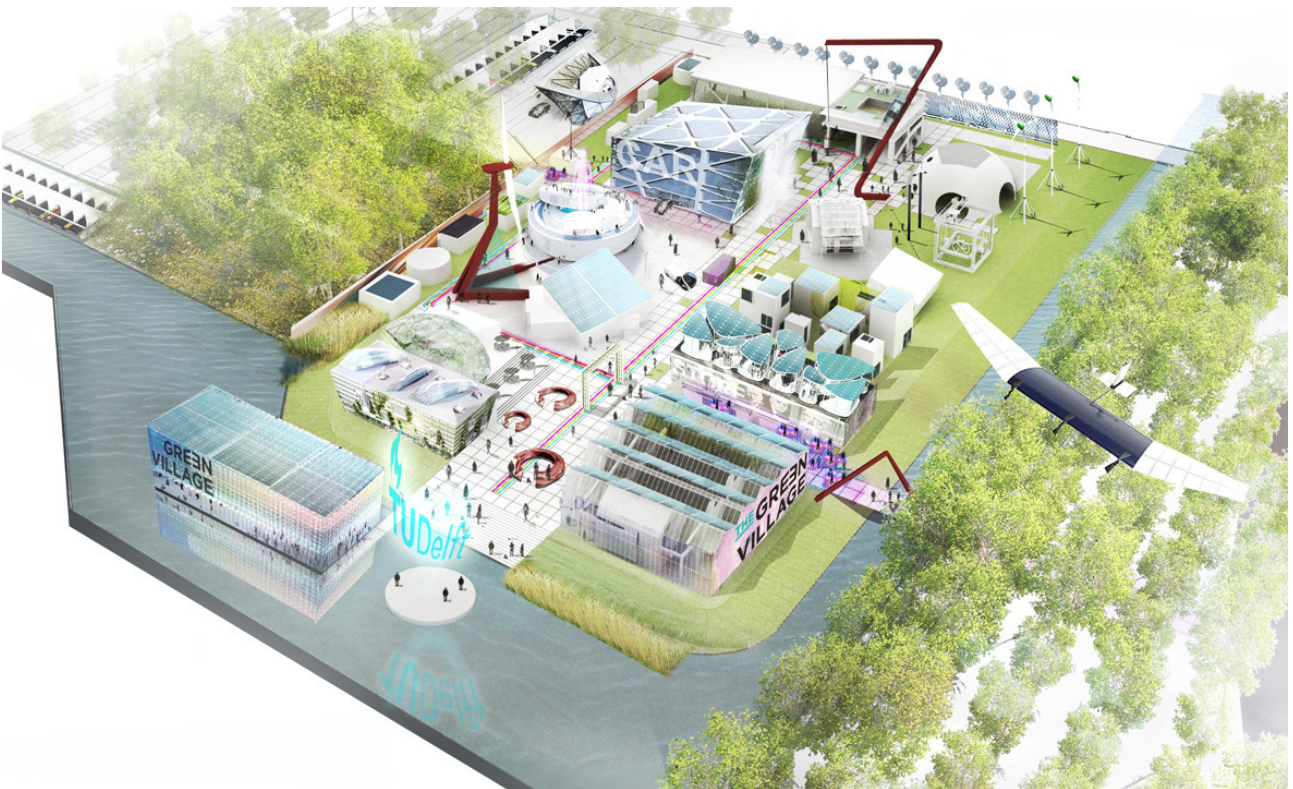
Birdview impression of the plans for the Green Village of the architects [Karres+Brands]
